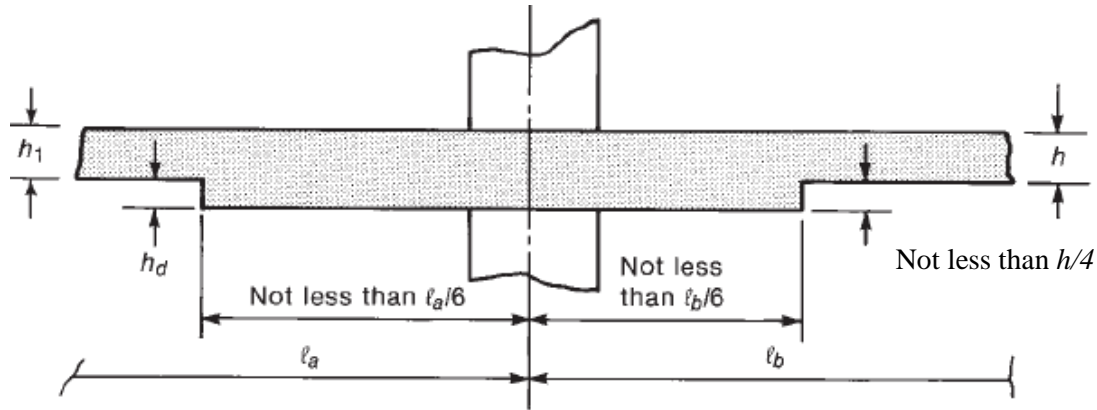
Minimum size of drop panel according to ACI Section 13.2.5.
